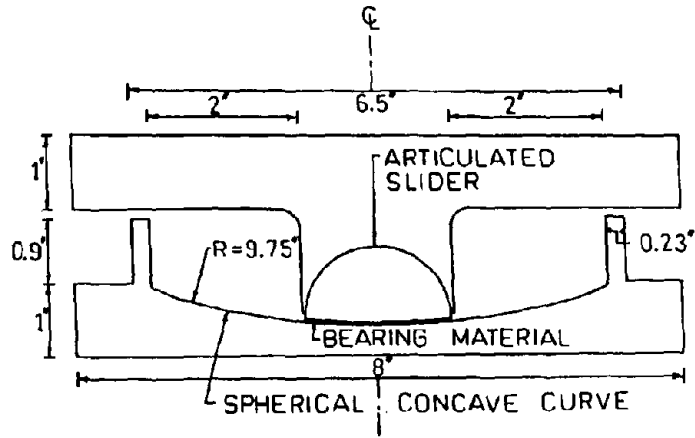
Bearing with Spherical Sliding Surface - FPS (1 in. = 25.4 mm).
